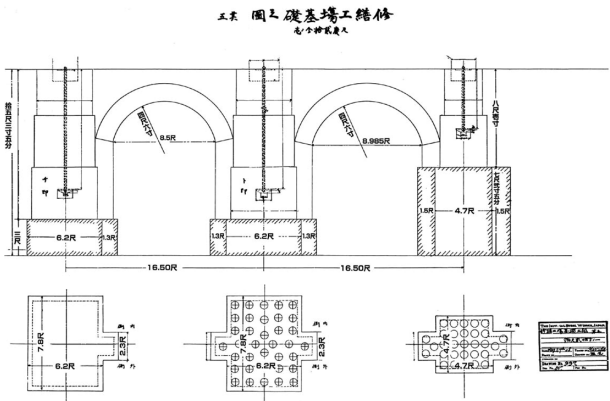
Foundation drawing of Repair Shop⁵⁾
